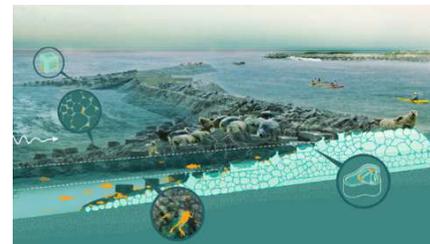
Details of Living Breakwaters (SCAPE, 2017)
